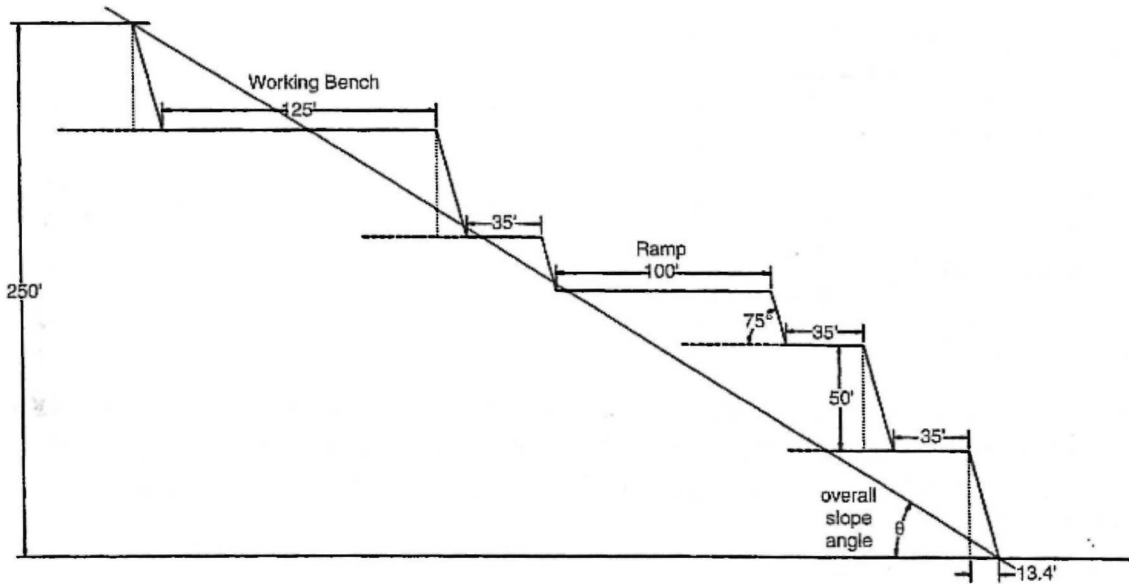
Overall slope angle with one working bench and a ramp section.
